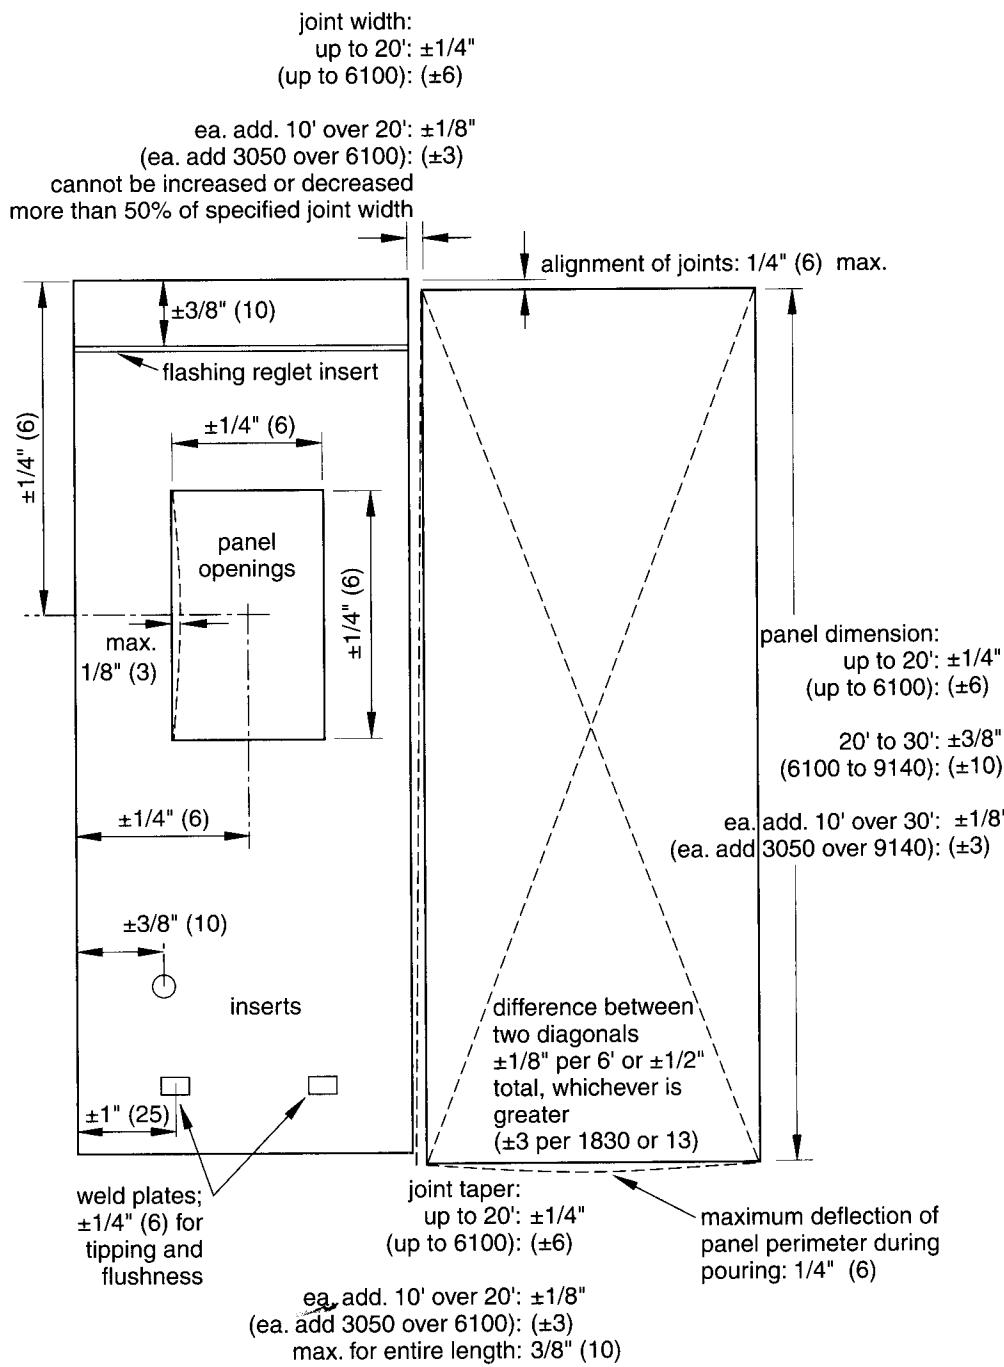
Glass-fiber-reinforced concrete panel erection
